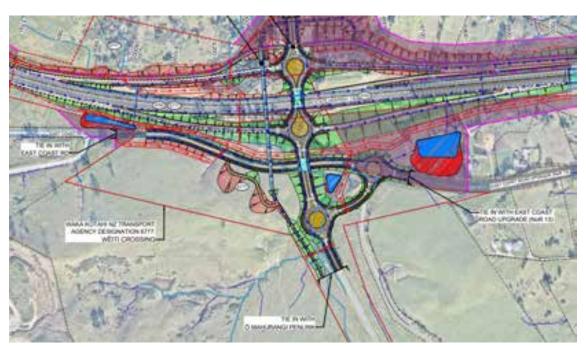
Extract from NoR 4 General Arrangement Plans, showing the extent of works proposed adjacent to WGL's landholdings (at the bottom of the image)
